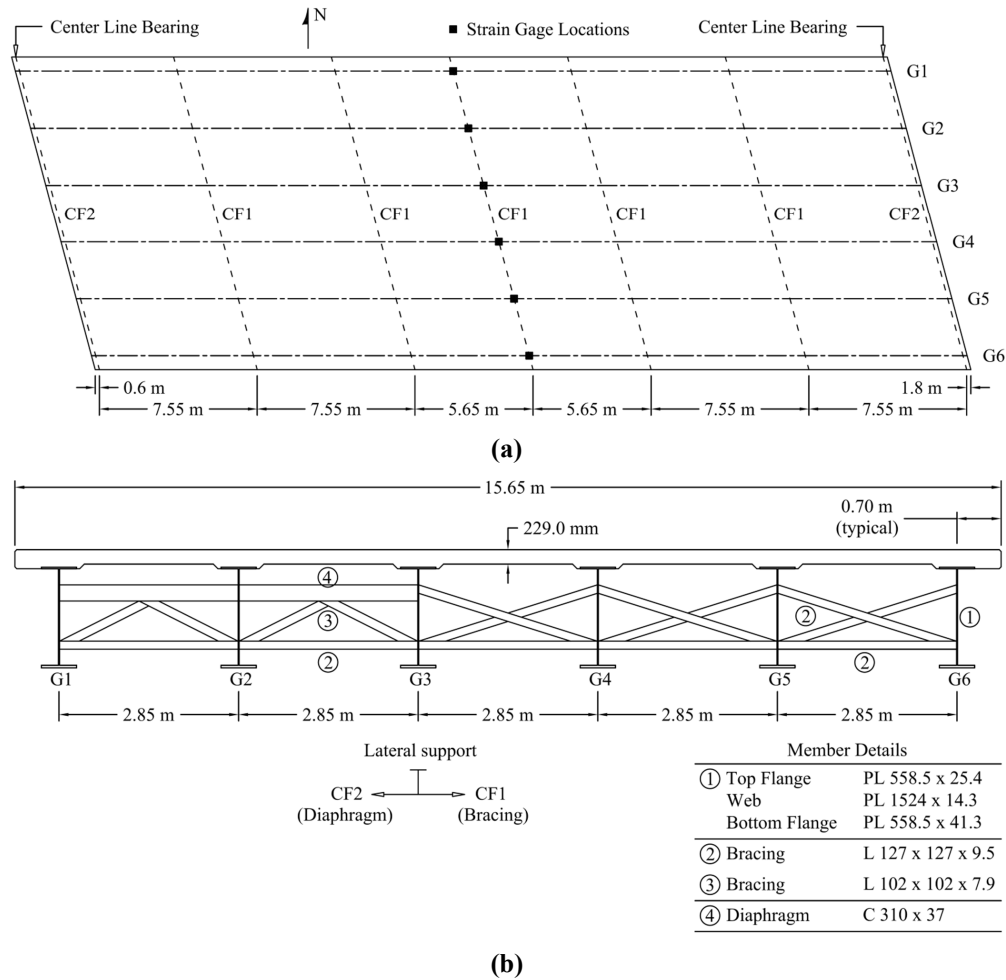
Huron Bridge: (a) plan diagram, (b) cross-section diagram
